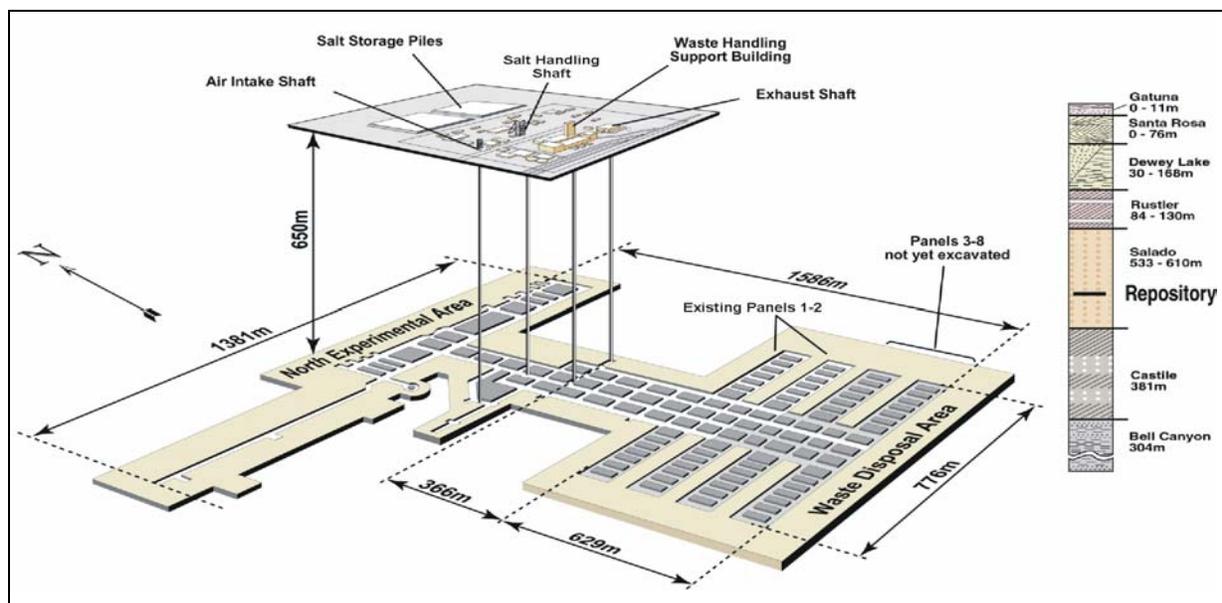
Schematic illustration of surface facilities and subsurface facilities/openings at the WIPP site.
